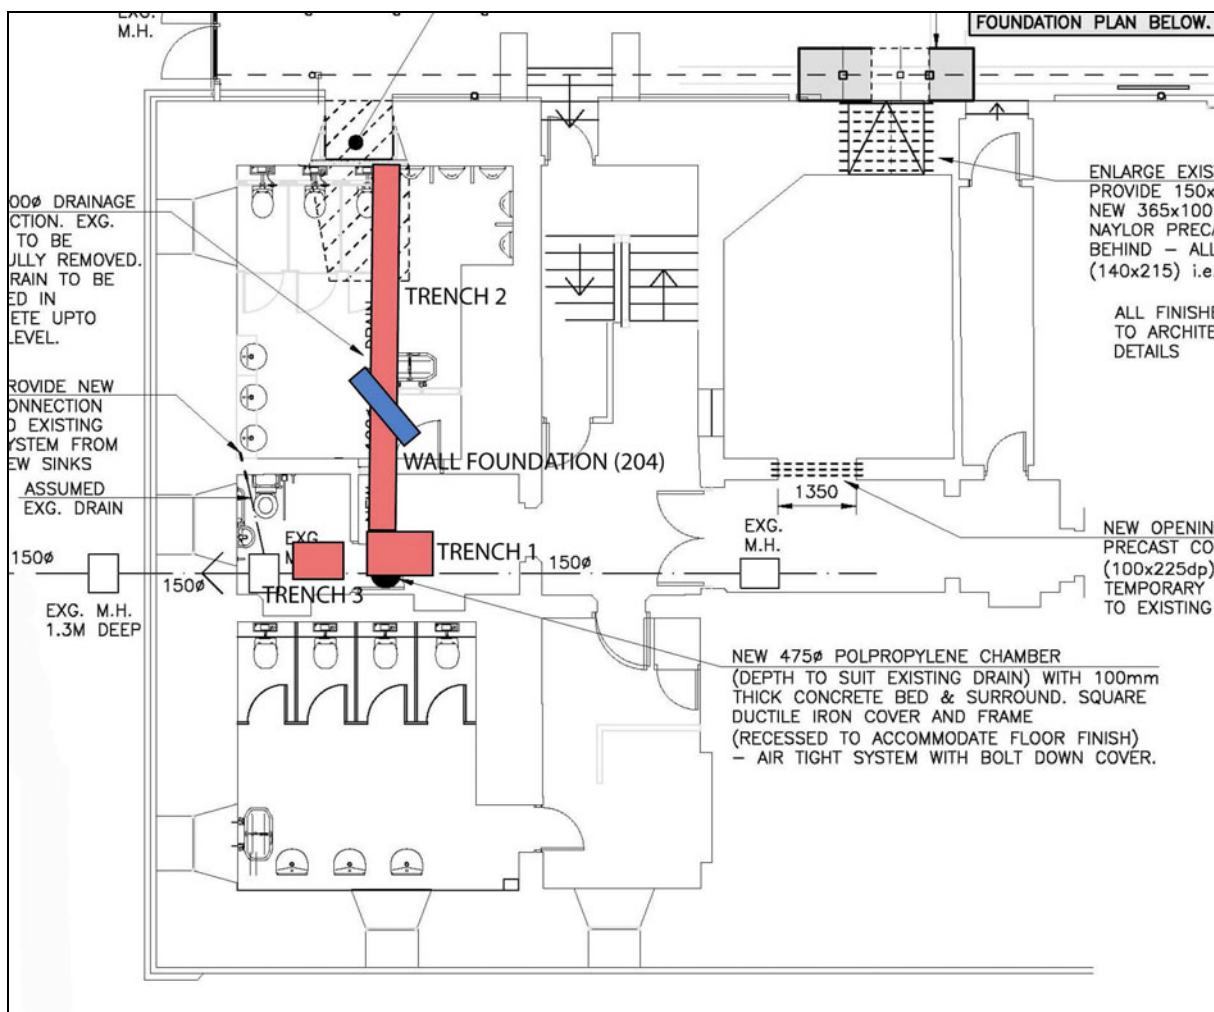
Plan of trenches monitored showing location of wall foundation (204)
